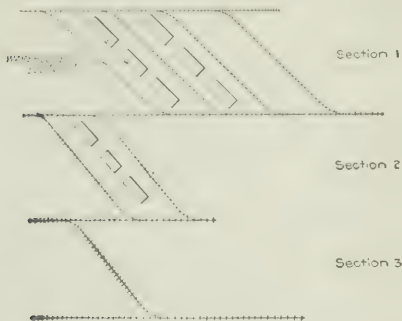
SKETCH SHOWS TYPICAL LAYOUT OF WAREHOUSE SECTION OF ARMY INTERMEDIATE DEPOT
